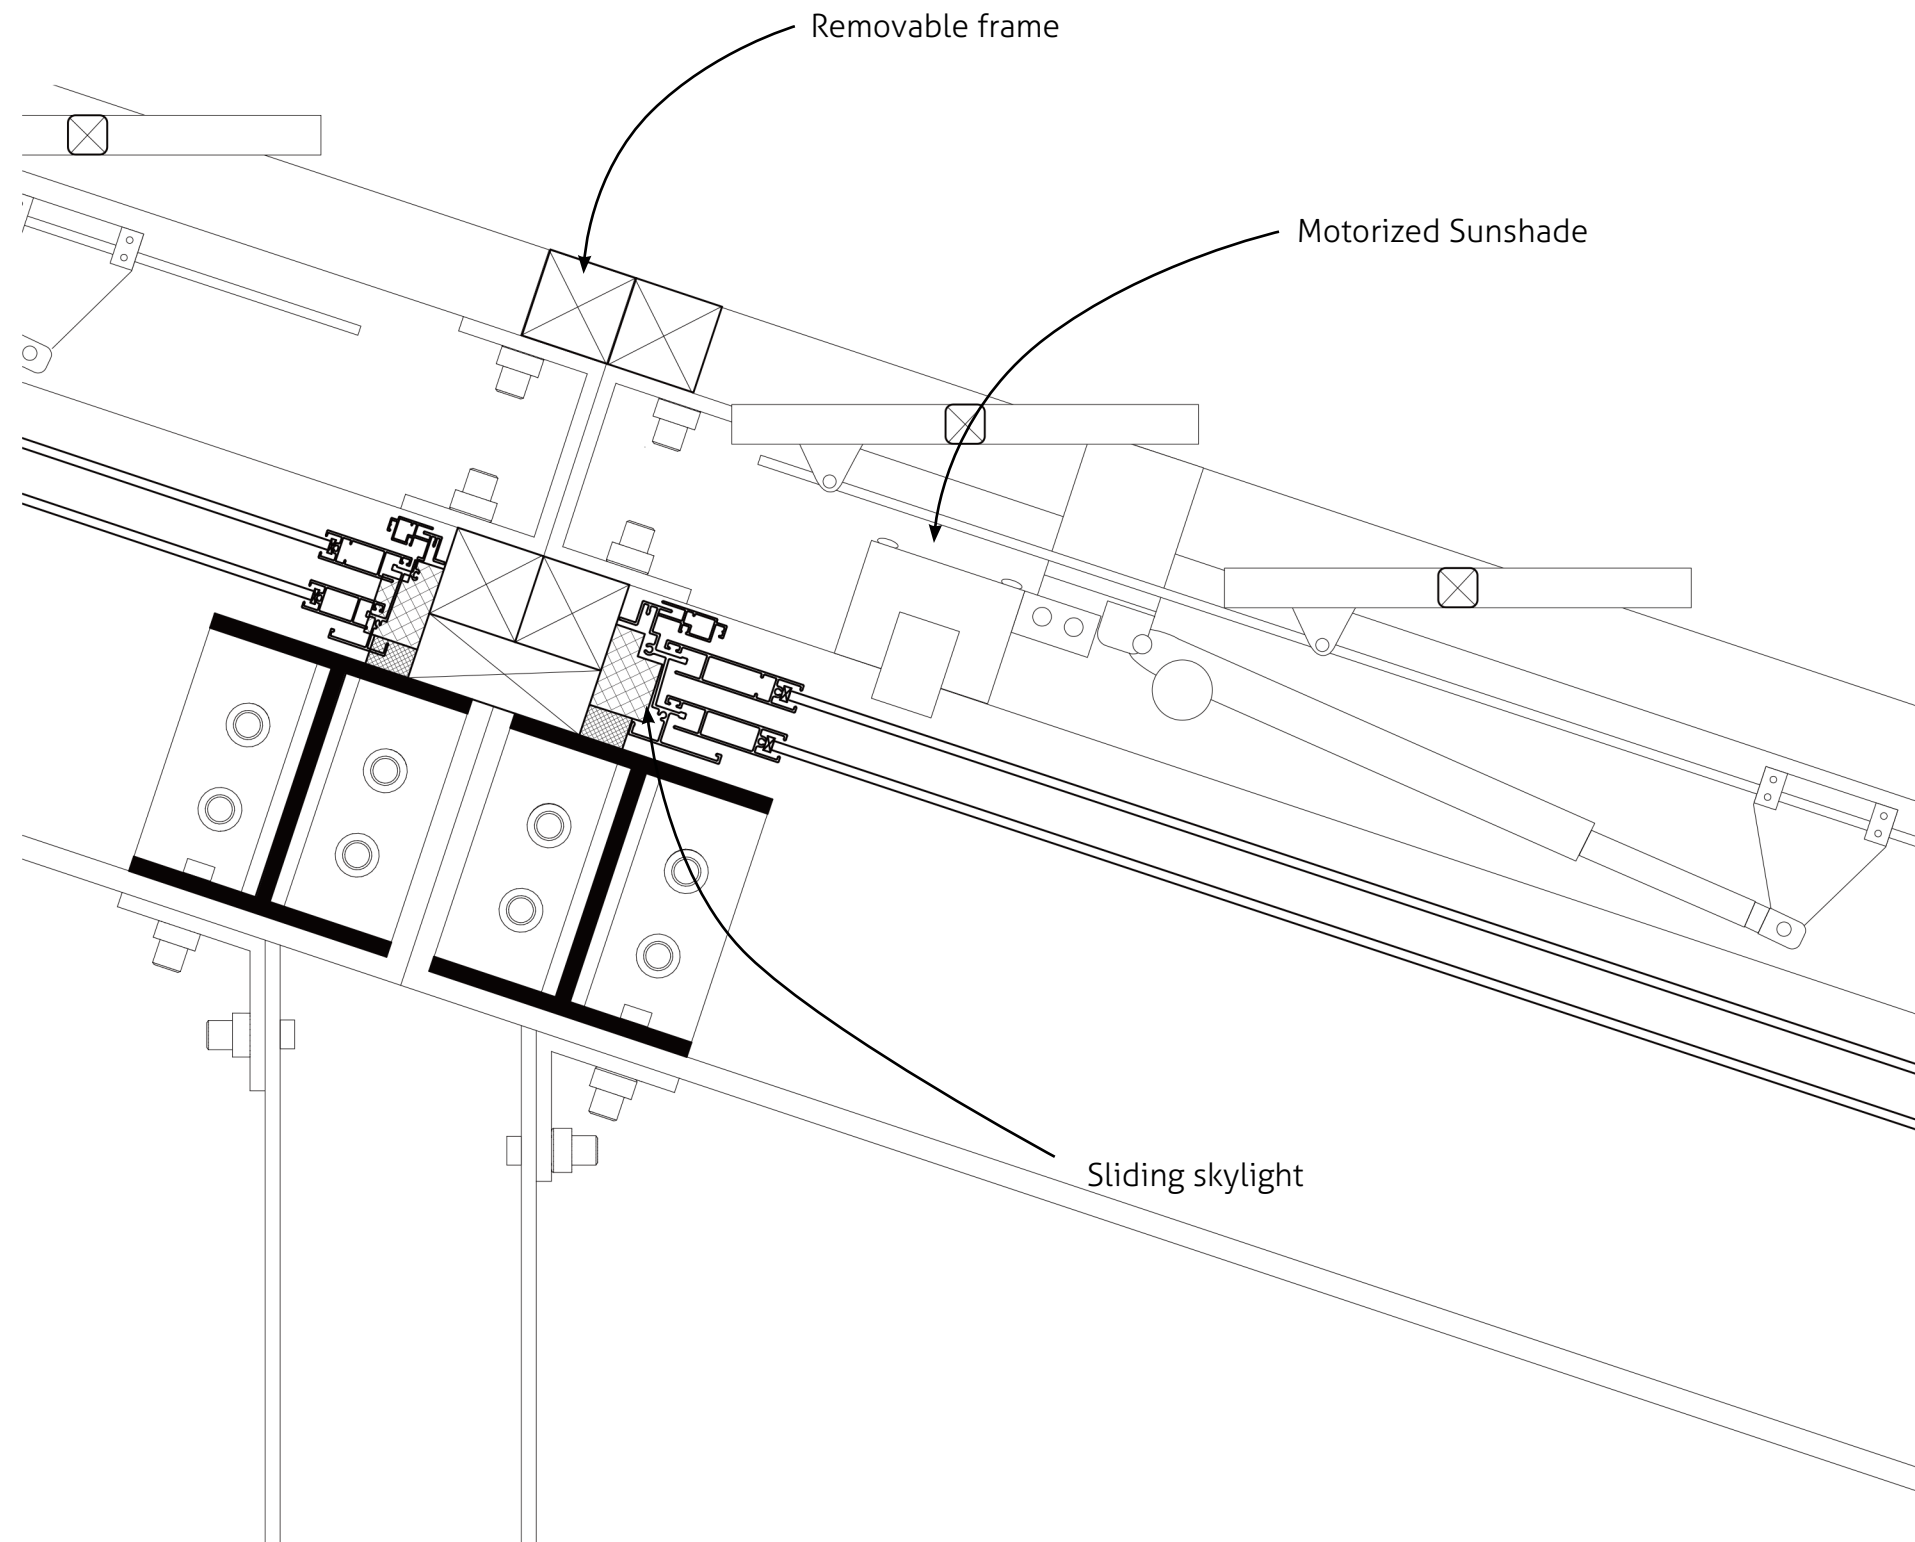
DETAIL ABOUT STEEL STRUCTURE, FLOOR AND FACADE
